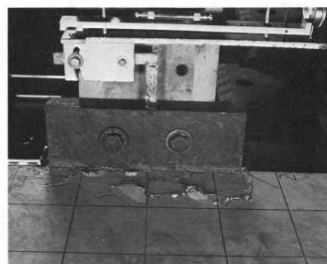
B-66: SPALLING AT END PLATE
